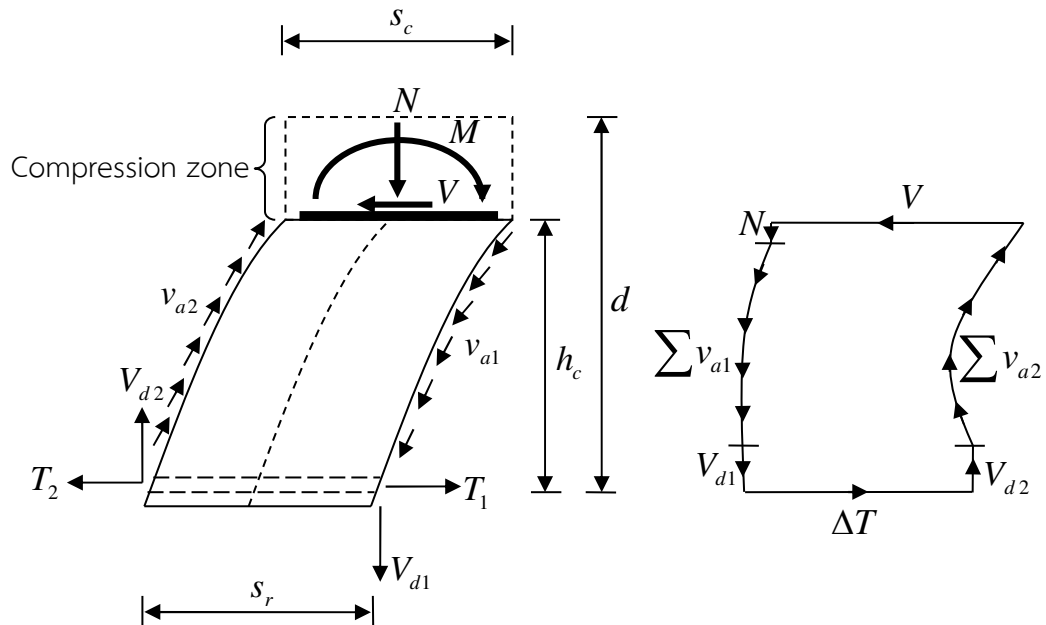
Beam actions on the concrete cantilever in the shear span
